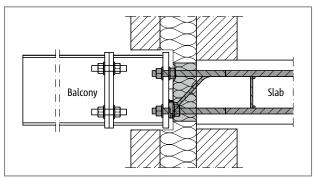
Schöck Isokorb® T type SK: Insulating element inside the core insulation; on-site adapter between the Isokorb® and the balcony to enable flexible installation.
